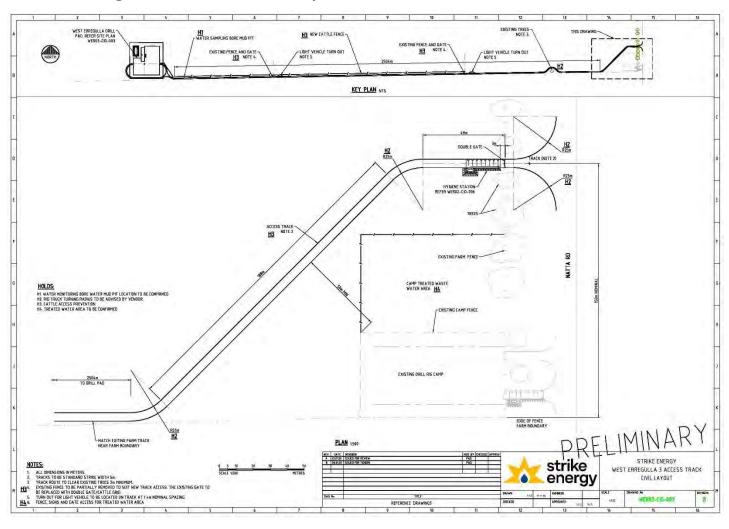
West Erregulla 3 Access Track Civil Layout
